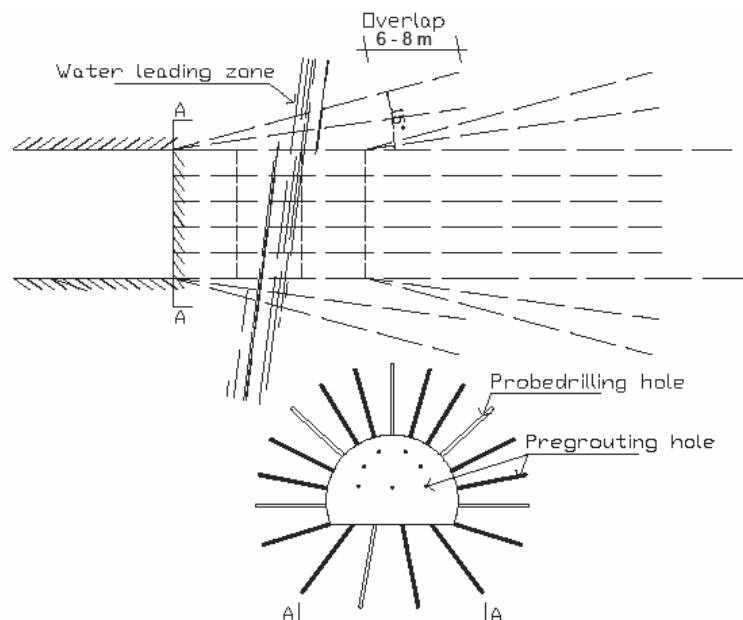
Principle drawing showing a longitudinal section of a tunnel with probedrilling and pregrouting holes (top), and a cross section of the same tunnel (A-A) (bottom).
